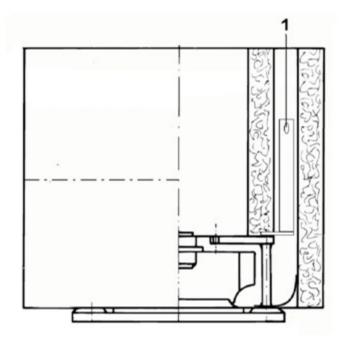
Roof fan with SDV sound attenuating hood and lifting eyes
